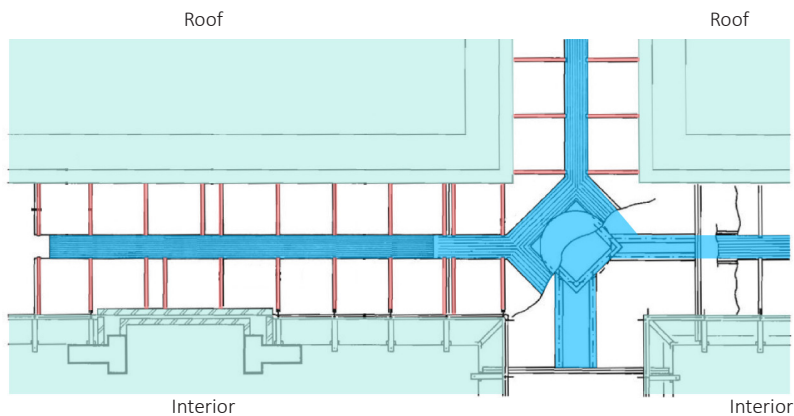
Rain drainage plan (M.Wang, 2017)
